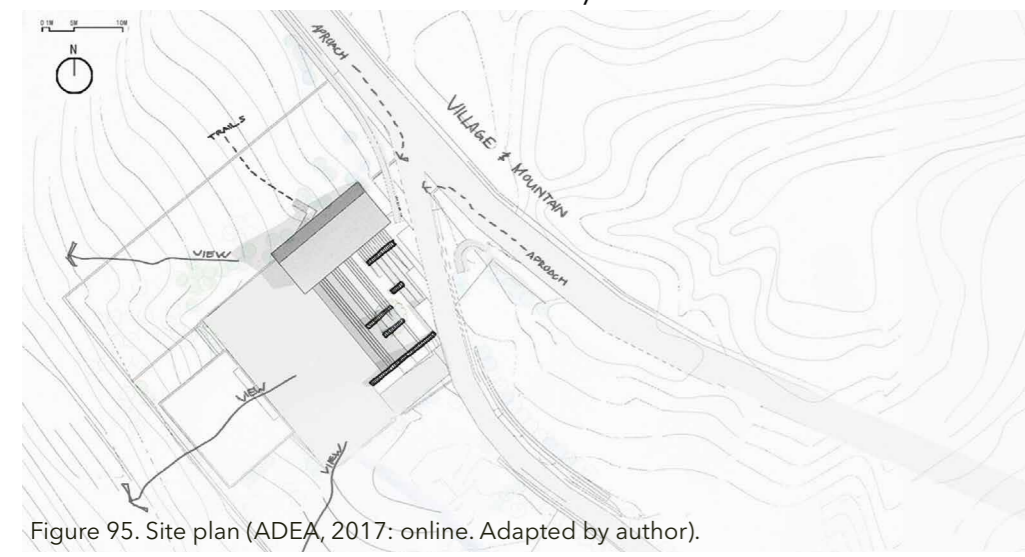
Site plan (ADEA, 2017: online. Adapted by author).
